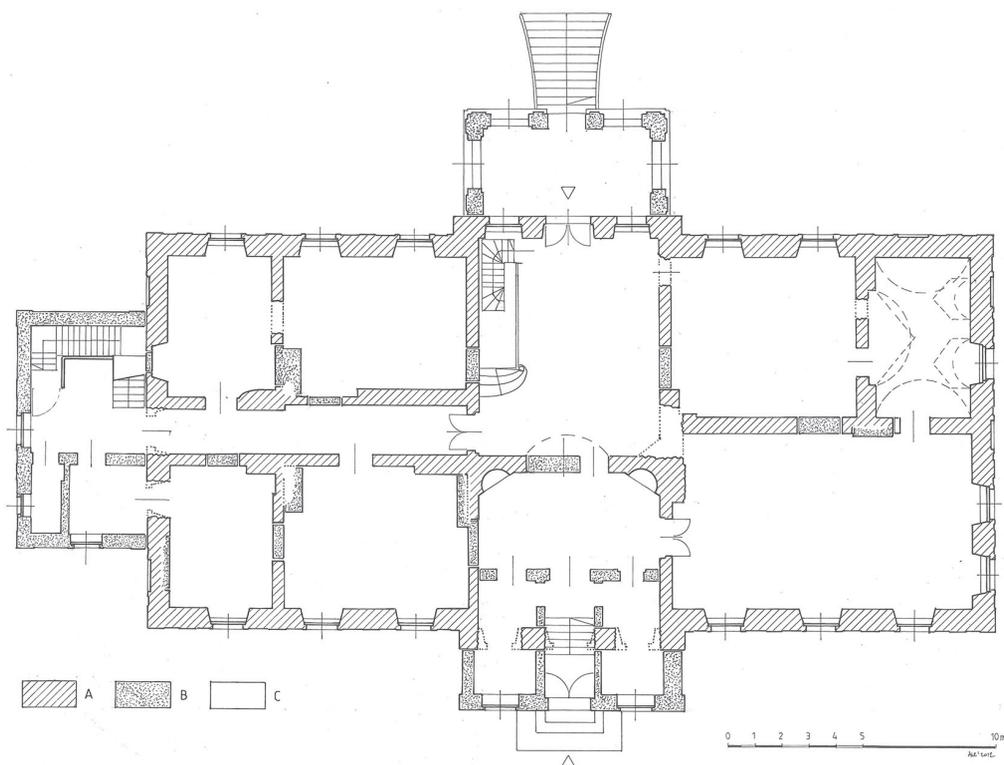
Rychnów (dep. Namysłów), palace, ground floor plan with chronological wall stratification. A – walls from 1781; B – walls from 1906–1907; C – contemporary and unrecognized walls (edited by A. Legendziewicz)
